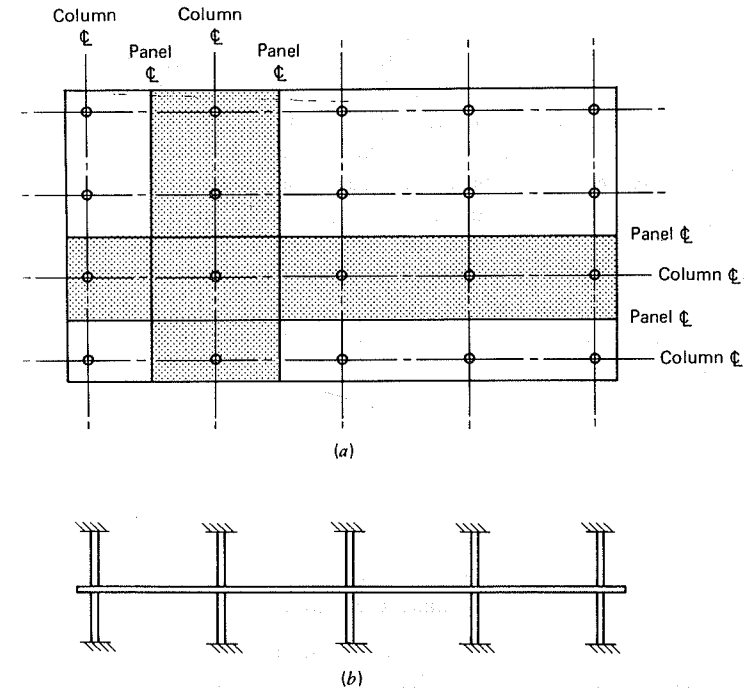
Building idealization for equivalent frame analysis. (a) Plan. (b) Elevation.
